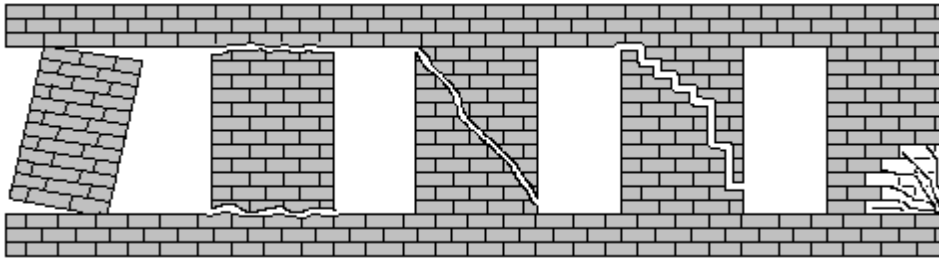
Rocking, Sliding, Diagonal Tension and Toe Crushing in Masonry wall (Tianyi Yi, 2004)
